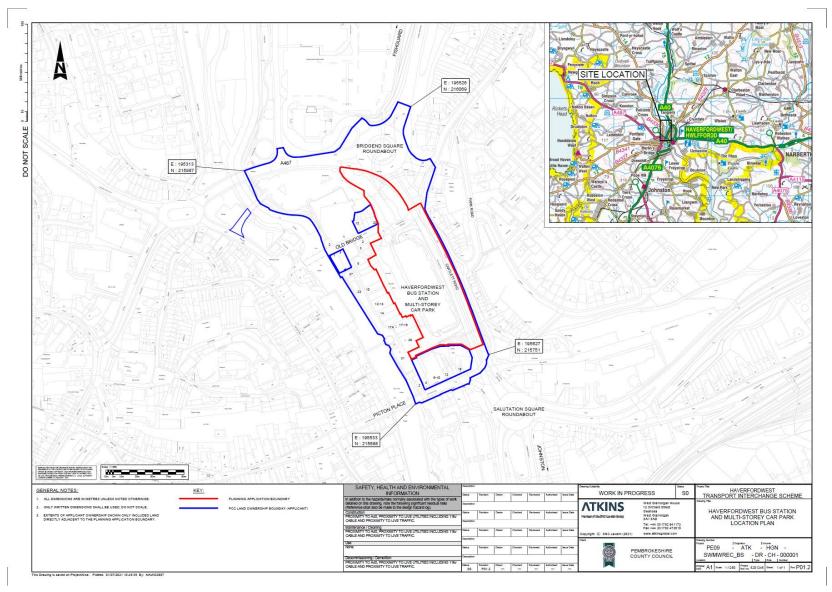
Detailed location plan of the site ownership boundaries (Provided by Client).
